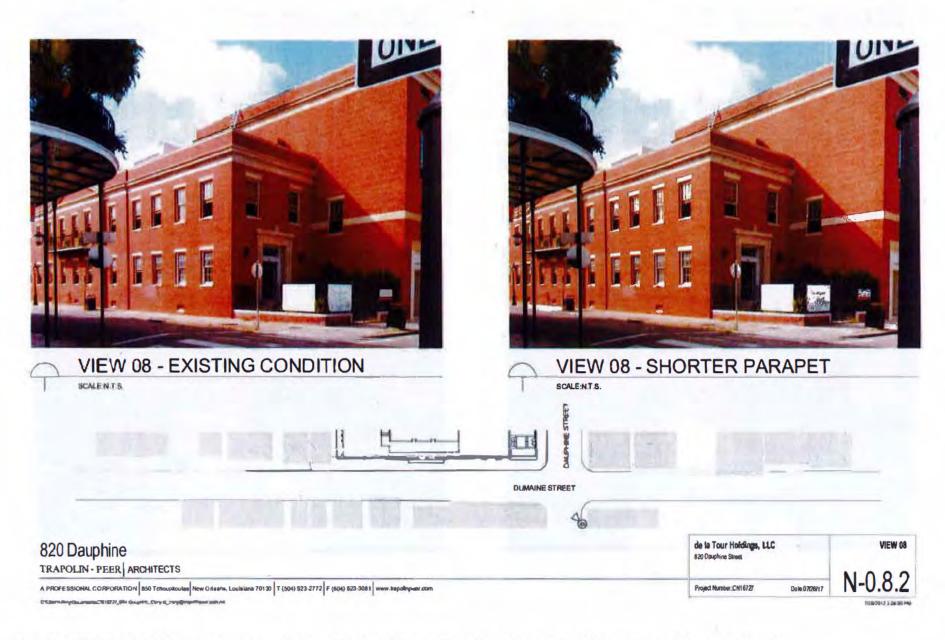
Photos of Addition, and proposed alteration to Addition, from the intersection of Daupine and Dumaine Streets.
